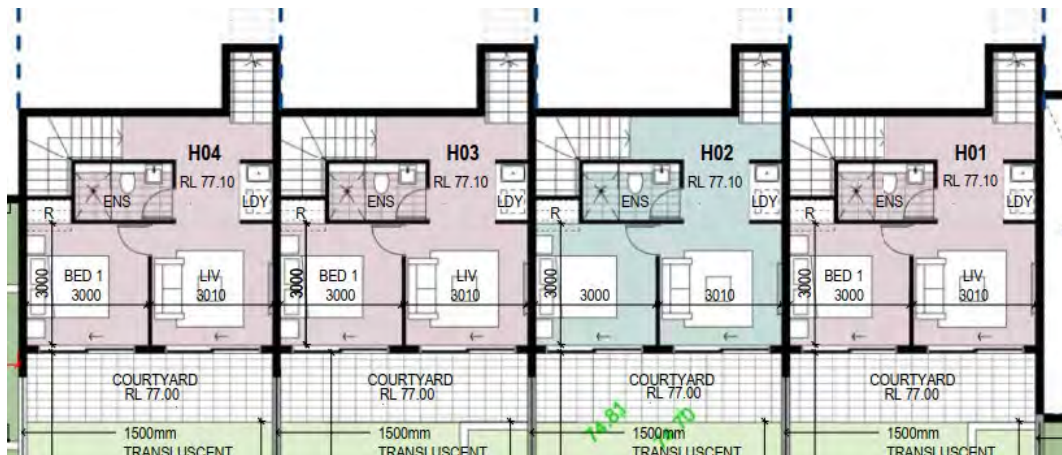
Floor plan extract depicting examples of secondary living rooms provided dimensioned and located for simple conversion into additional bedrooms
